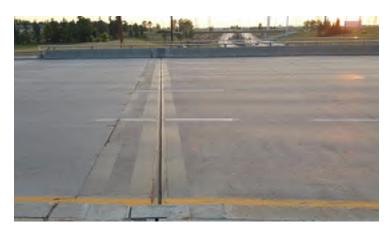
Expansion joint between south approach and span 4, southbound lanes, very narrow gap.
